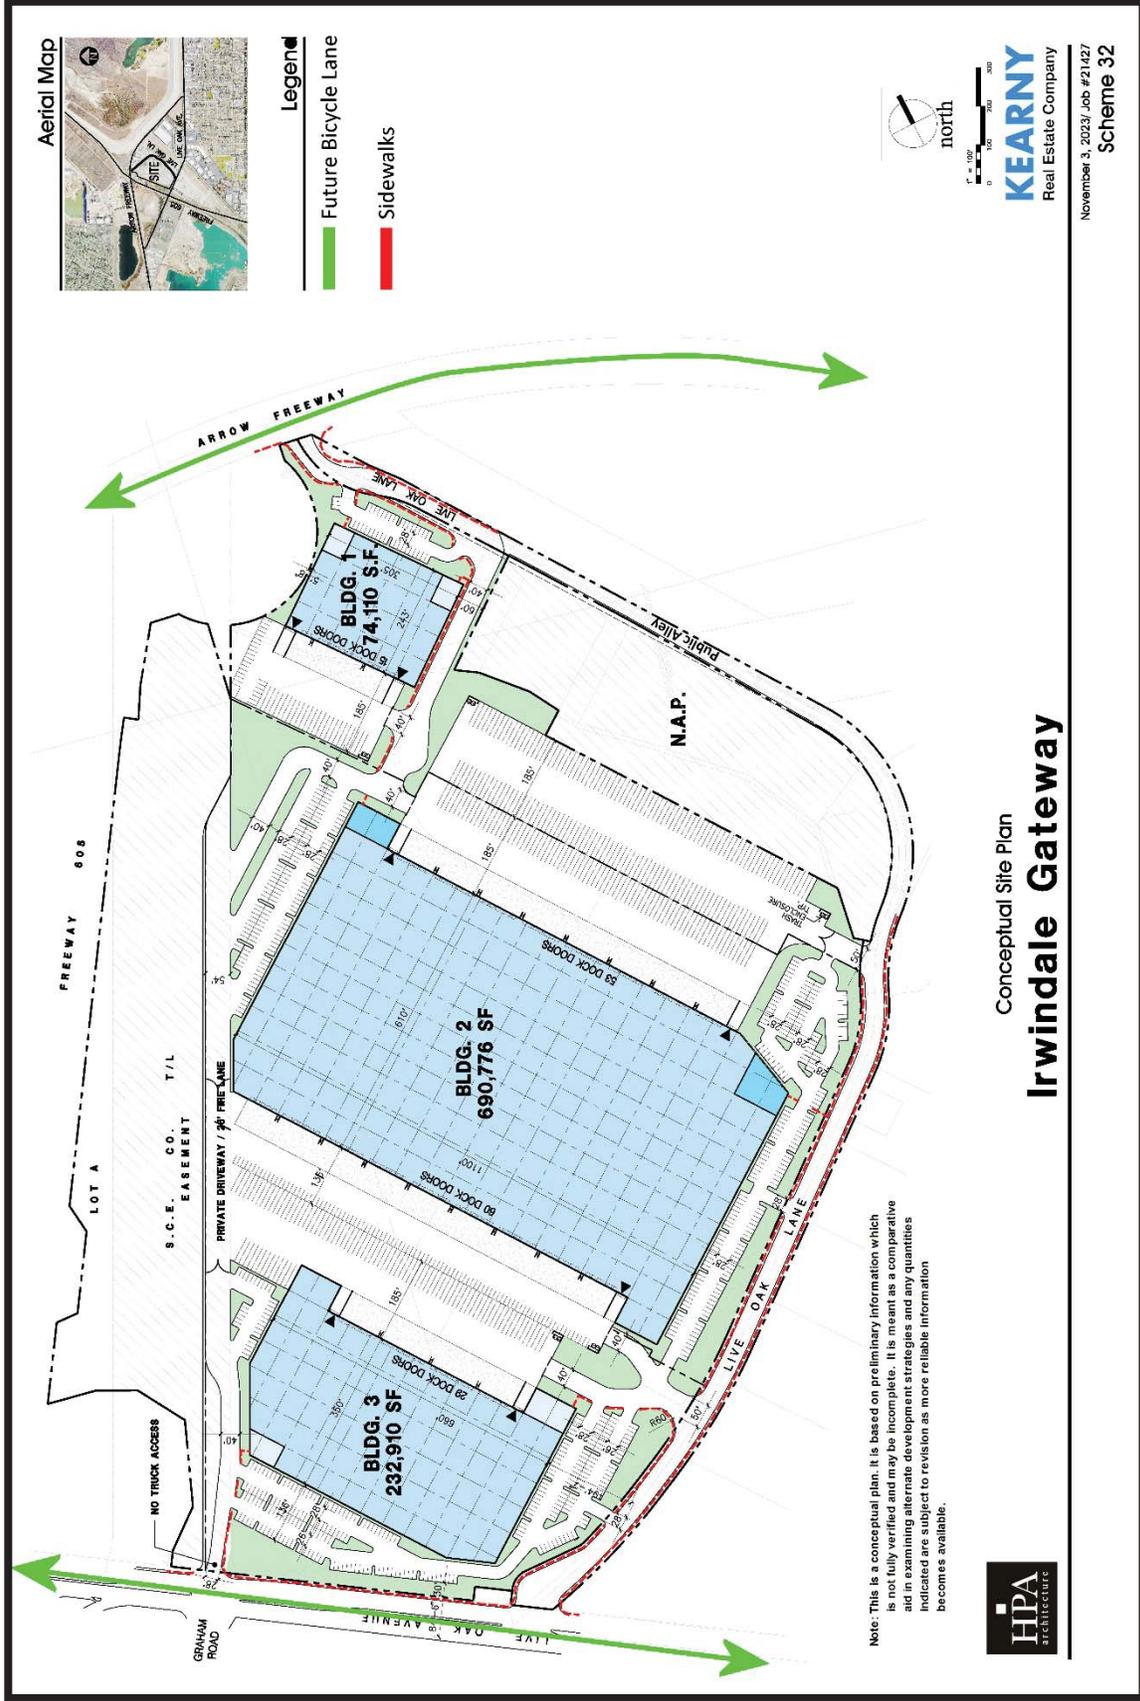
CONCEPTUAL NONVEHICULAR ACCESS PLAN
